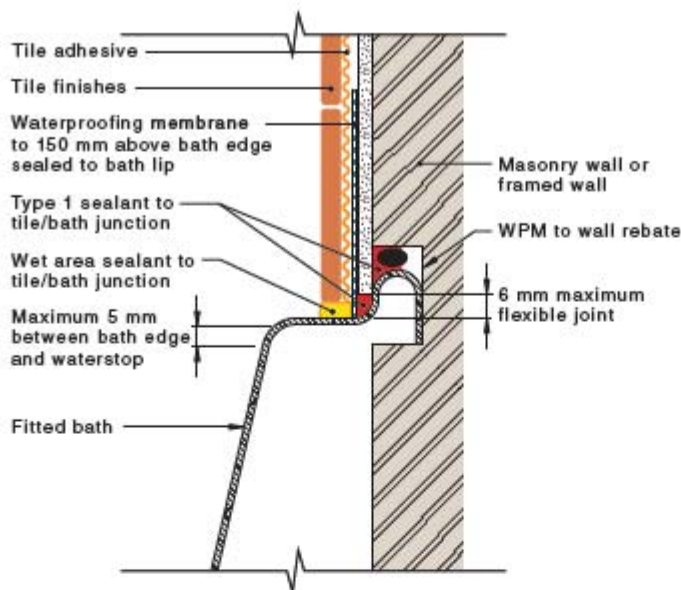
(A) — Shower over bath — Fitted bath — Framed or masonry walls
